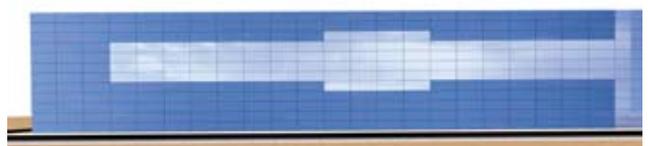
The south façade combines a curtain wall with aluminium panelling.
